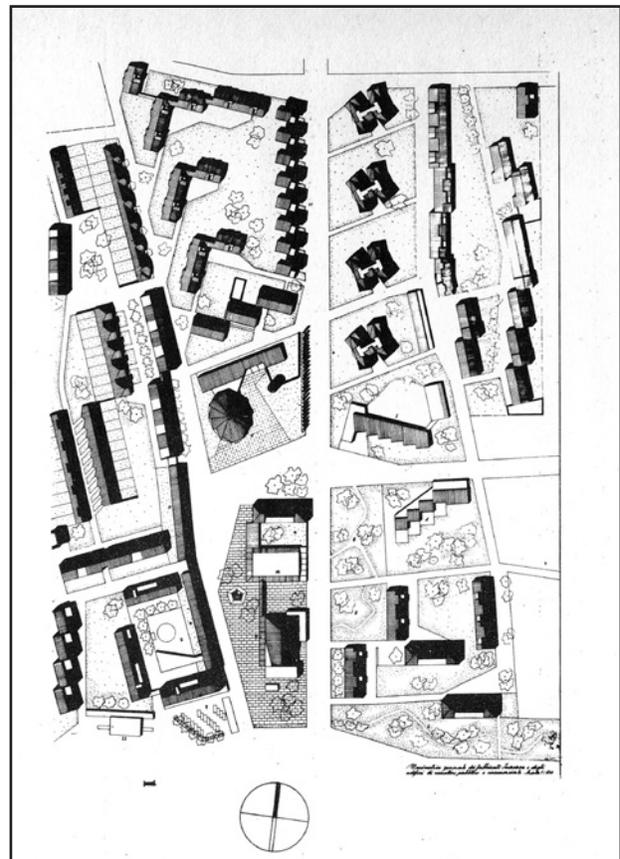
Site plan of Borgo Panigale, Bologna with the church shown as an oval plan. (the final design was circular) and the cinema, which was never constructed at the bottom center of the site plan.
